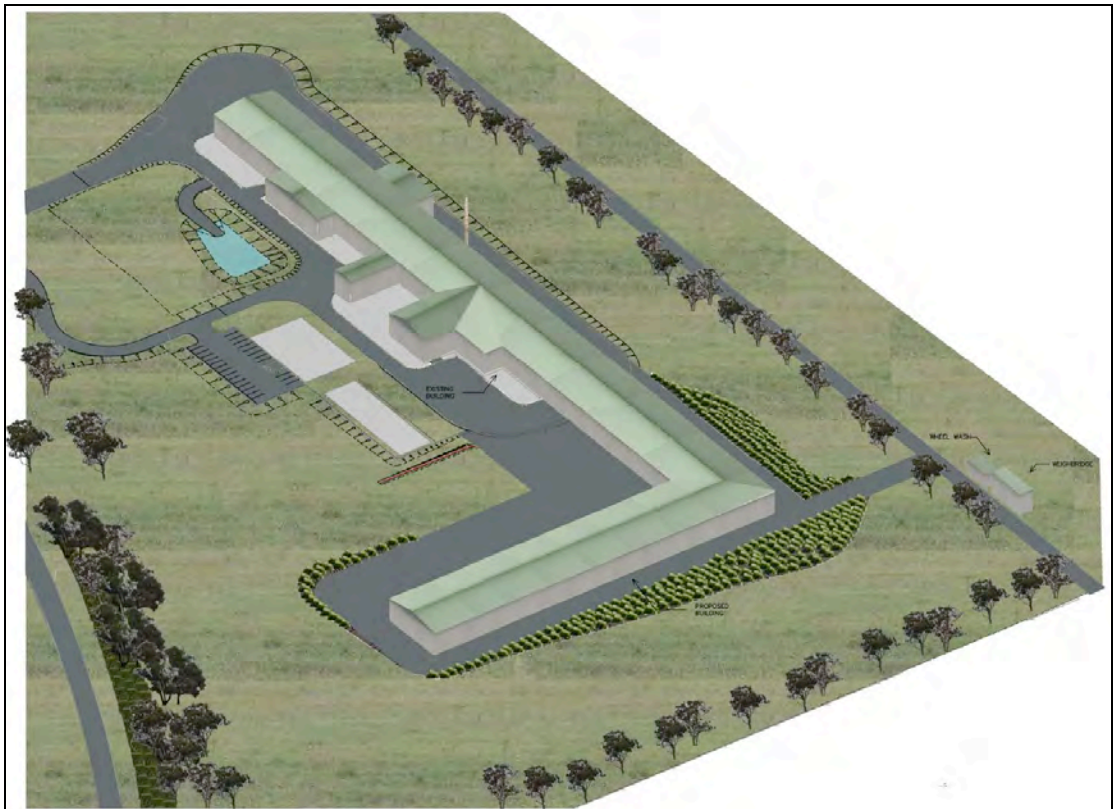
RMT Expansion – 3D Elevation looking NE with landscaping treatment rendered
